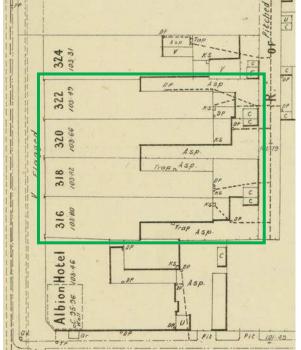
Footprints of the row at 316-322 Smith Street in 1900, indicated by green polygon (MMBW Detail Plan 1196, dated 1900).
